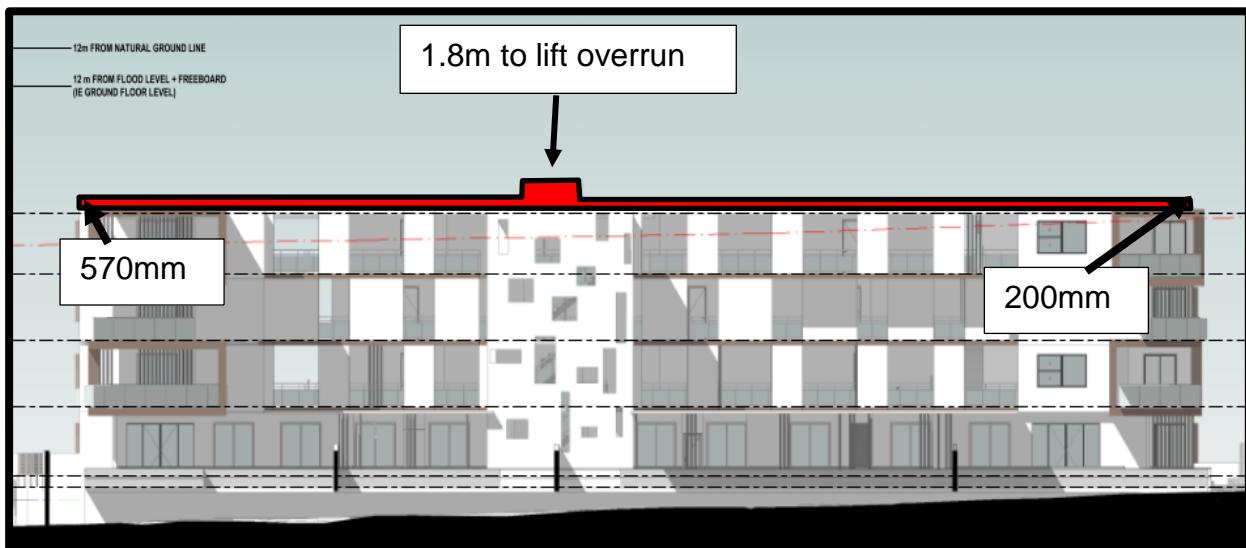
Height Exceedance from proposed FFL from south elevation Building D (post-fill)
